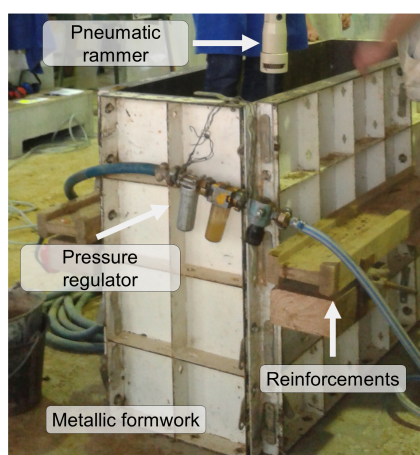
Metallic formwork and its equipment, from N. Meunier.
